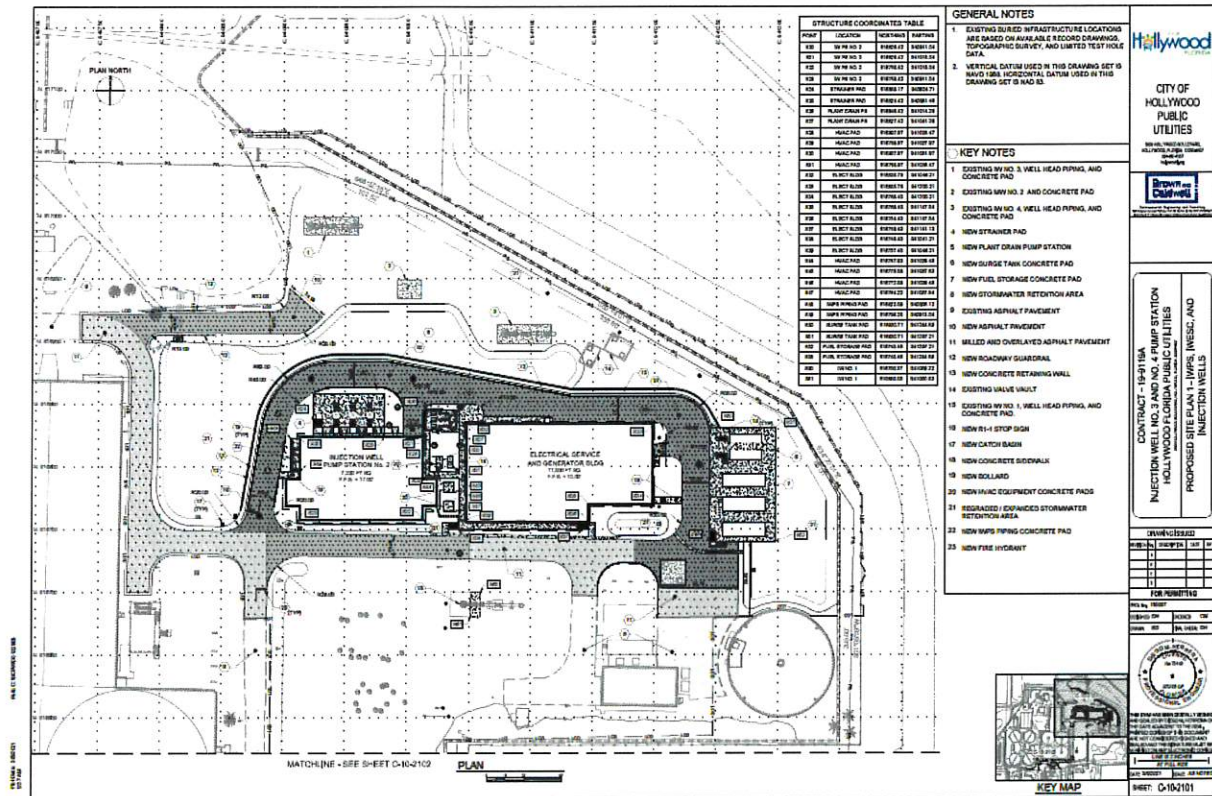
Preliminary Layout of Proposed Injection Wells, Pump Station and Associated Facilities
